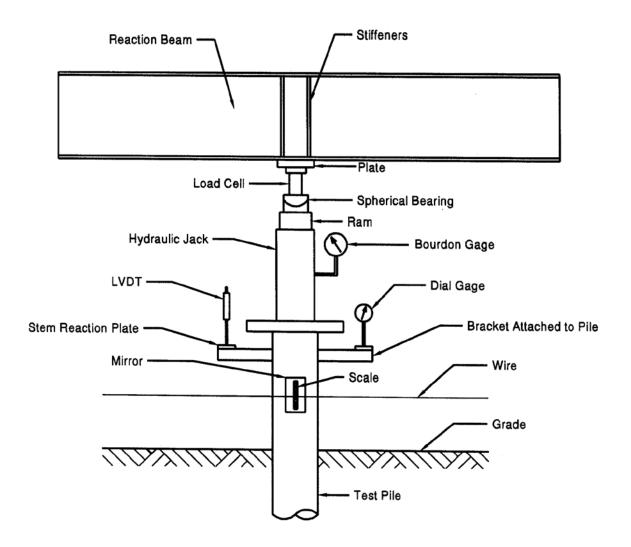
Typical arrangement for applying load in an axial compressive test (Kyfor et al. 1992)
